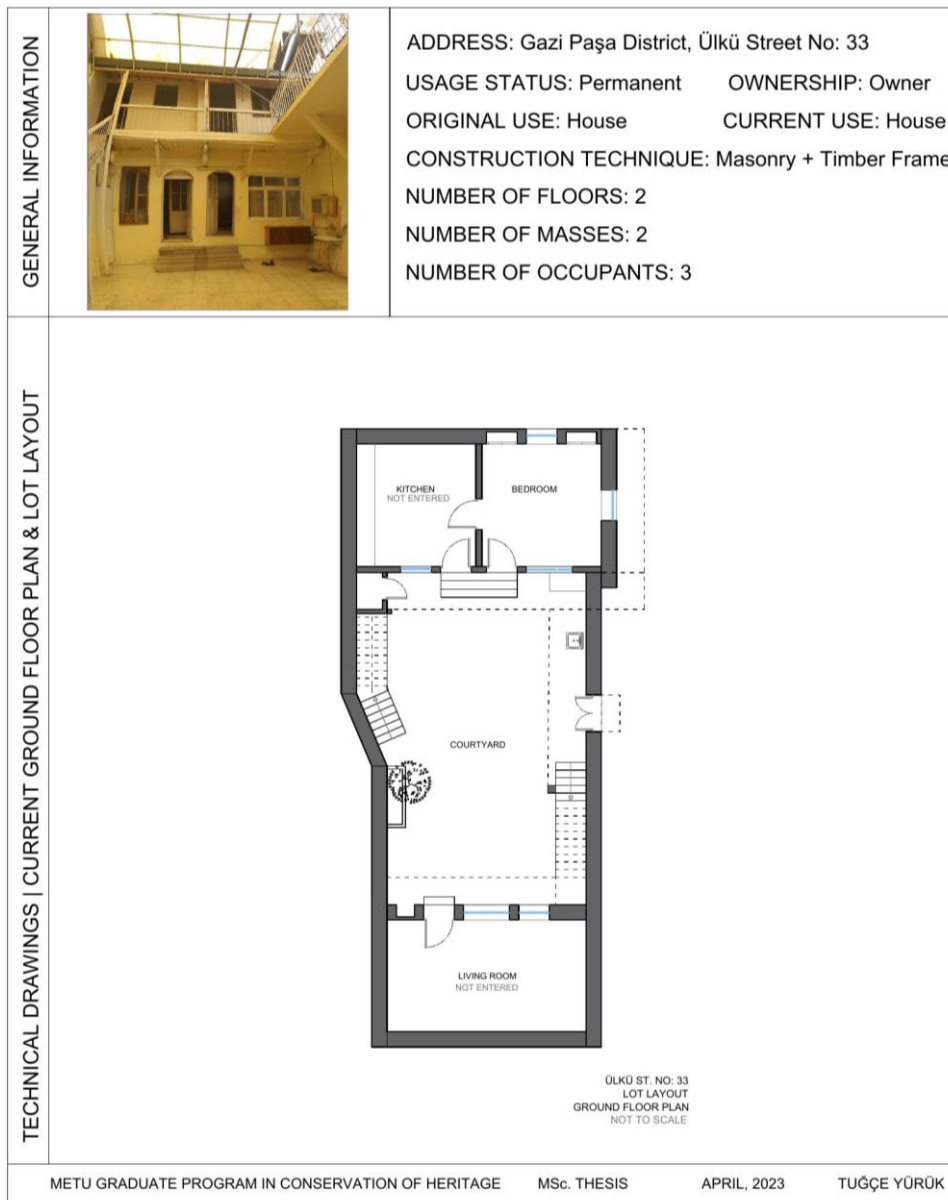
Current ground floor plan of Ülkü-33 House (Author, 2023)
